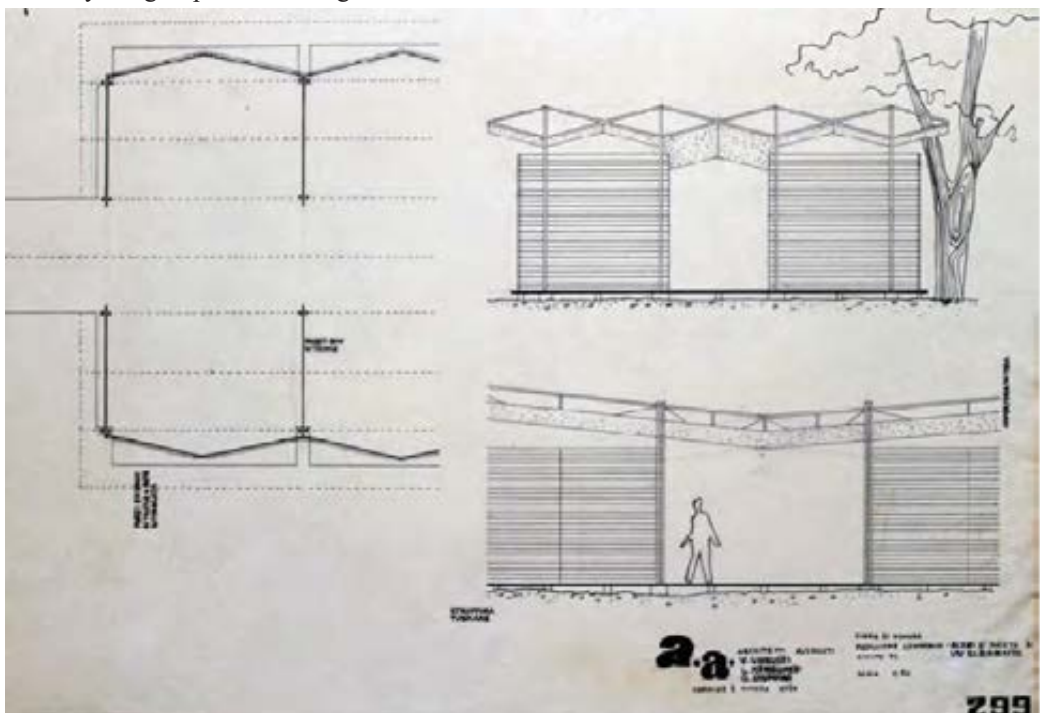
Trade Pavilion plan and section of one element_CASVA concession
